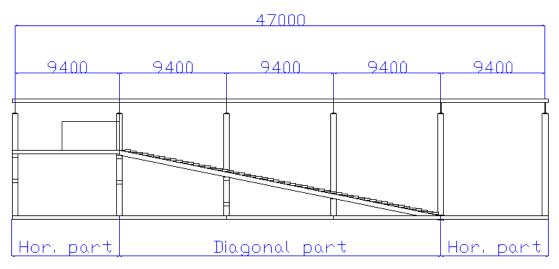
Longitudinal cross-section of theatre 1 along line 2 of figure 10.2.
